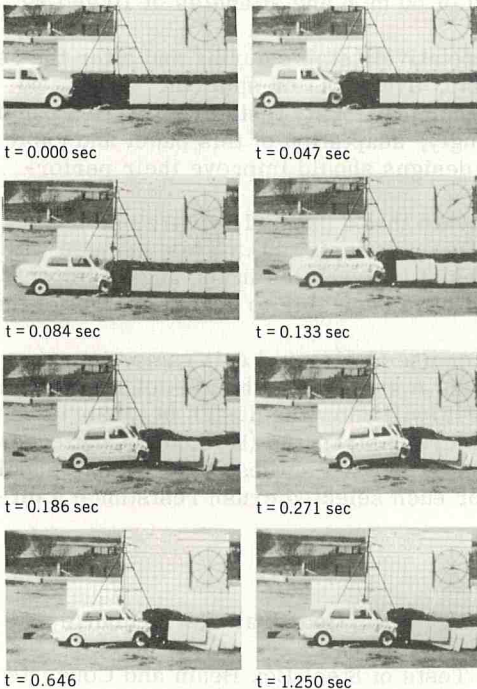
Sequential photographs of Test C (view perpendicular to barrier).
